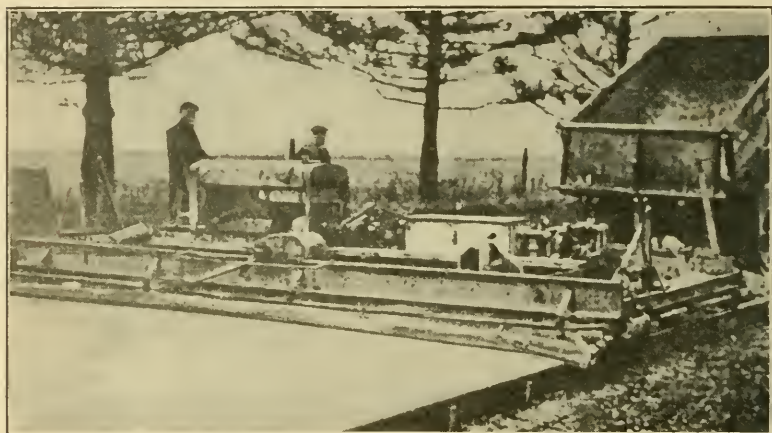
Finishing machine on 18-ft. concrete roadway.
